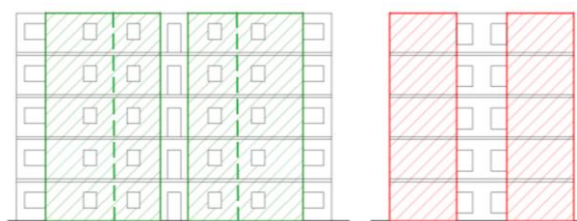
Case study - structural elevation, X façade (green) and Y façade (red)
